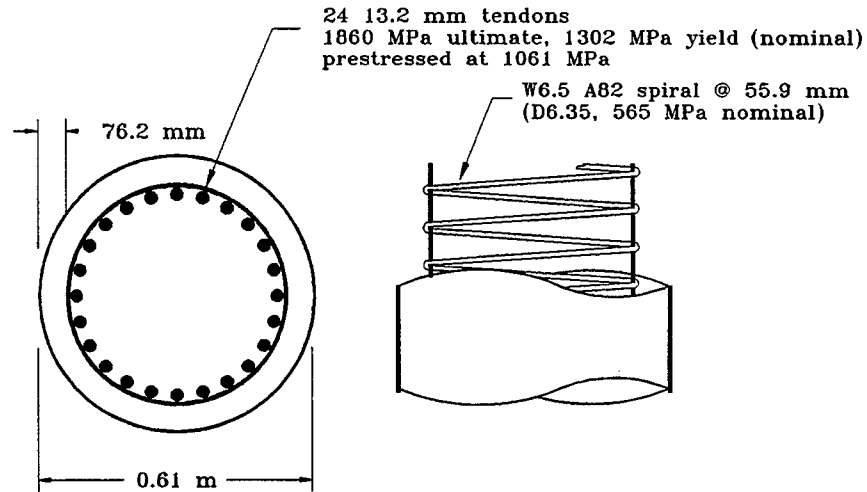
Dimensional and reinforcement details of pile shaft test units PS15 and PS16
